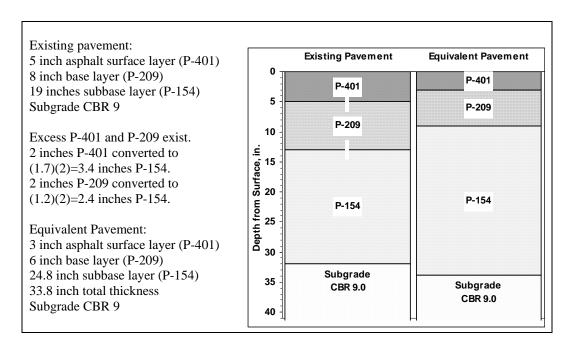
Flexible Pavement Example 1 Cross-Section
